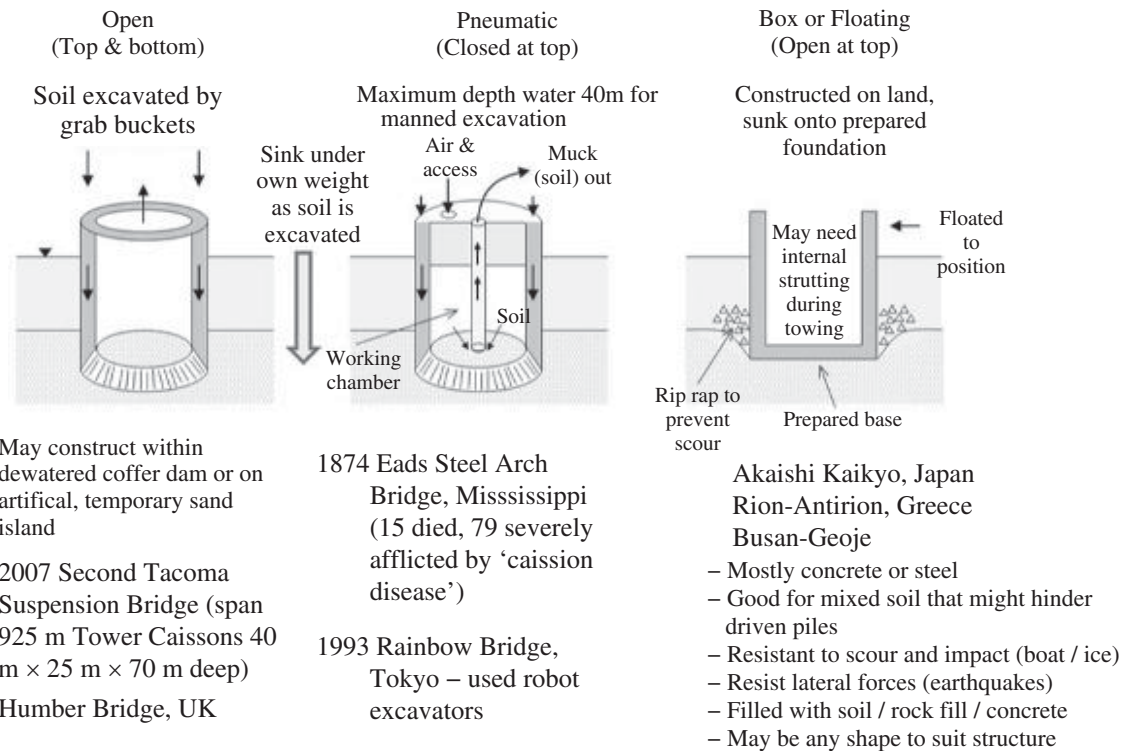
Different types of caisson commonly used for large bridge foundations, with examples.
